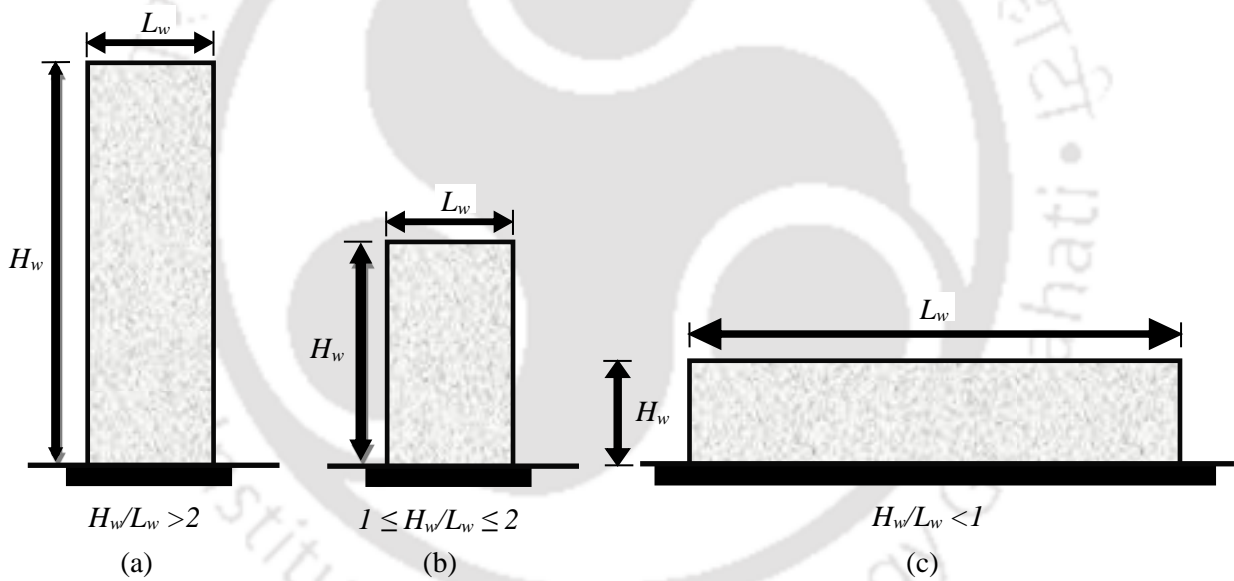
Classification of RC structural walls based on aspect ratio: (a) slender wall (b)intermediate wall, and (c) squat wall.
